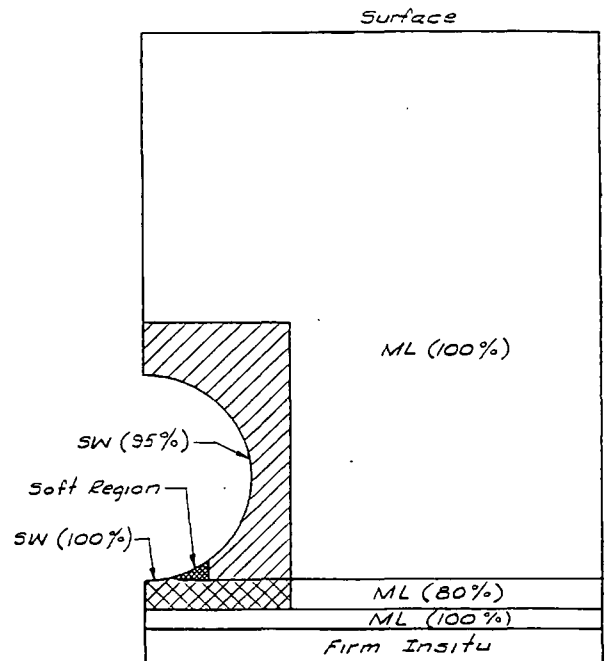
Finite element model of pipe-soil installation at Site 2.
